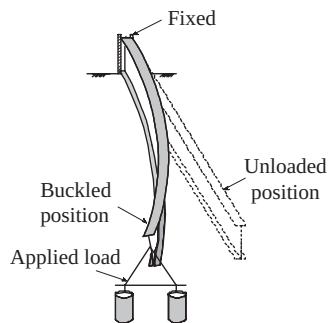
Lateral-torsional buckling of a slender cantilever beam
